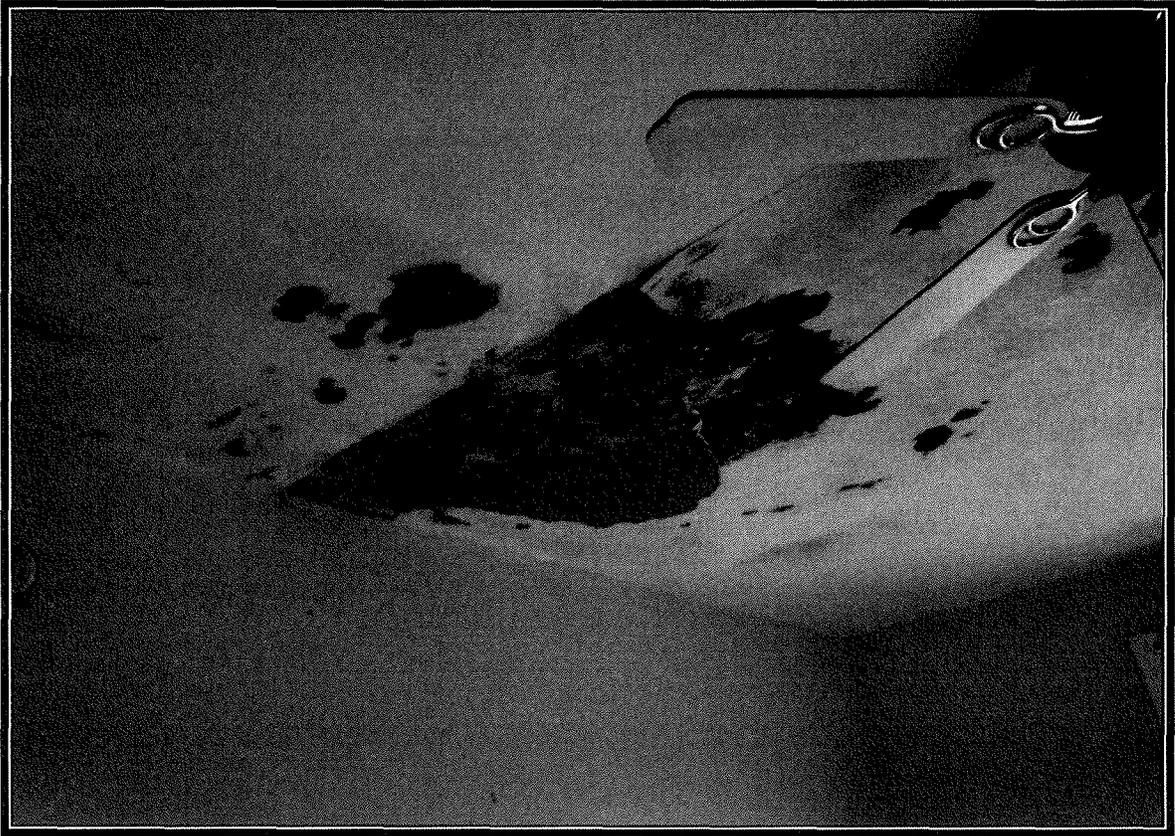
Damaged ceiling and development of mold due to moisture from roof leak.
